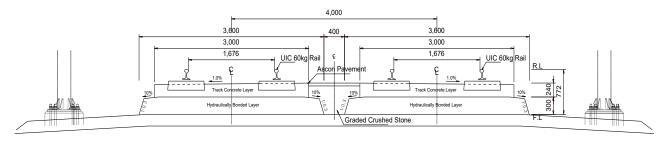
Cross-section of Non-Ballasted (Slab) Double Track on Earth Work
